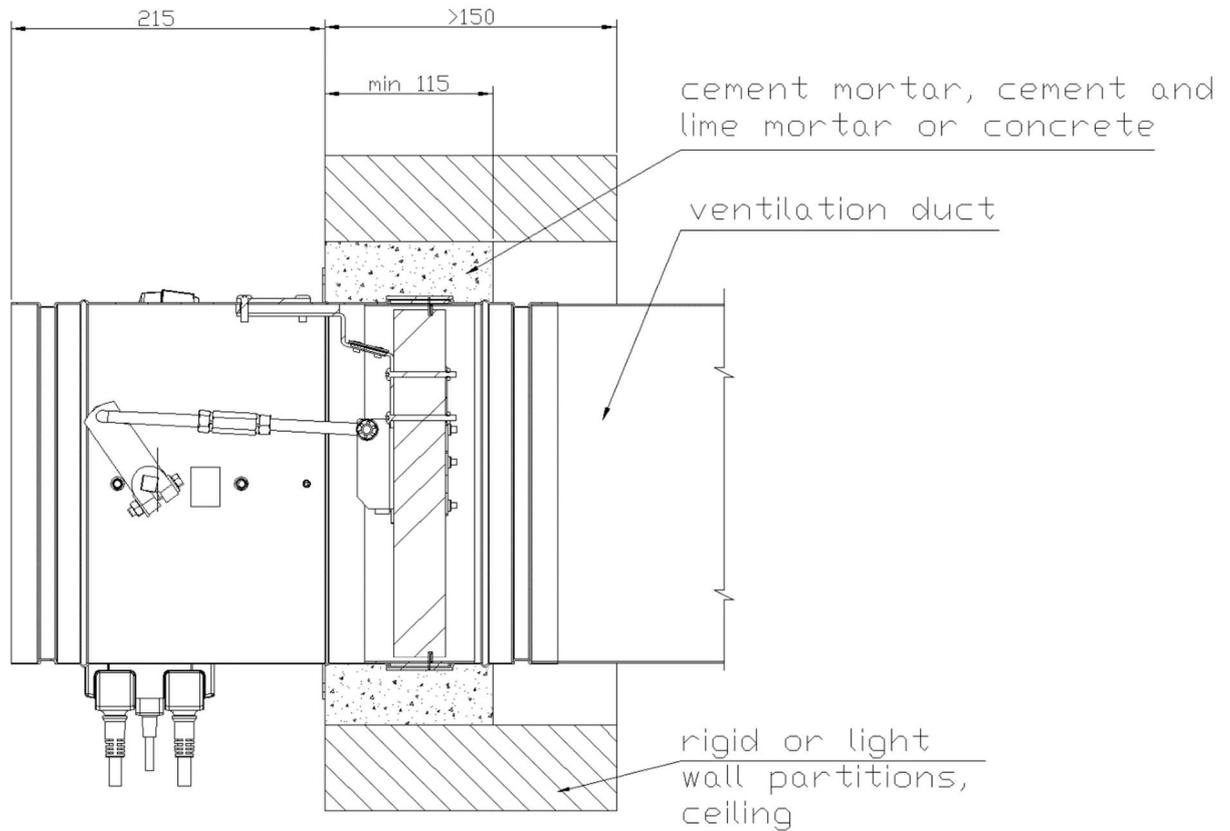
Installation method of fire dampers KTS-O in high wall thickness constructions
